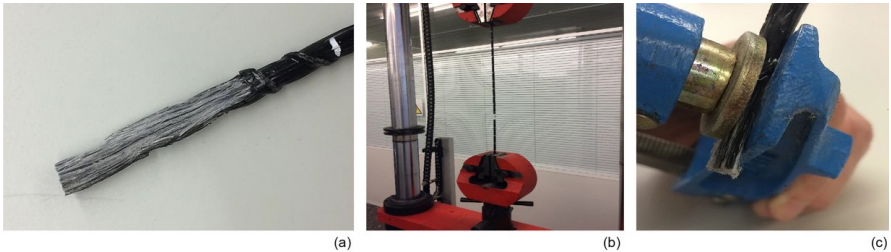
(a) Worked end of a GFRP rod; (b) GFRP rod tensile test; (c) Tightening of the BFRP rod
